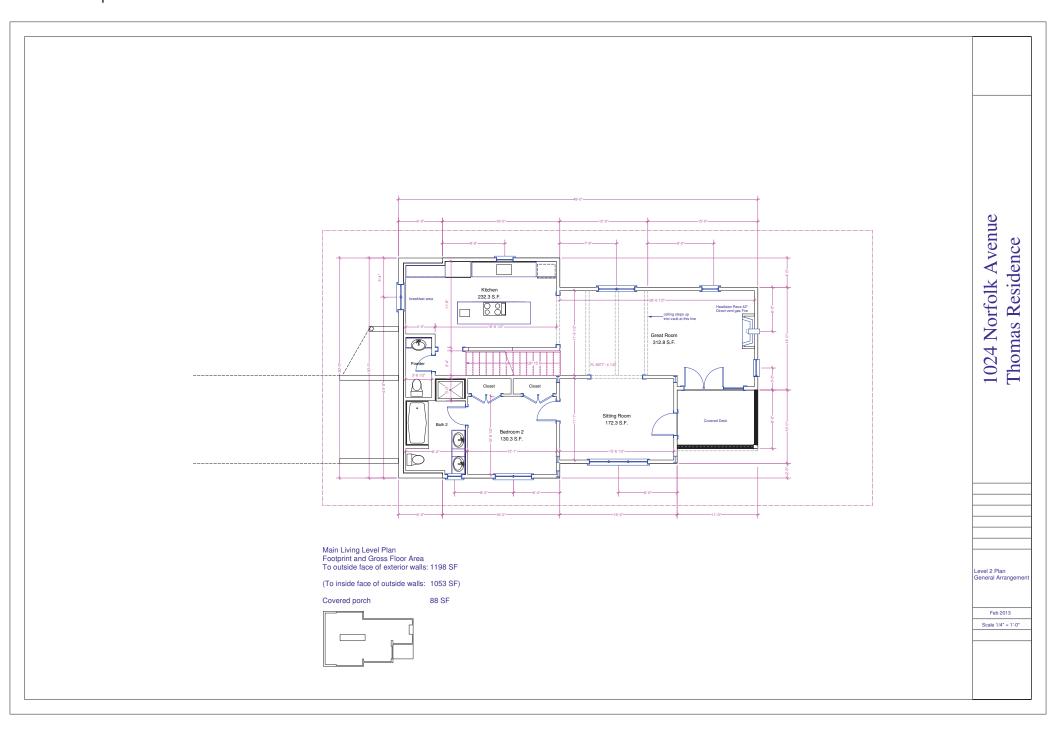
Exhibit D – Proposed PlansExhibit D – Proposed Plans
